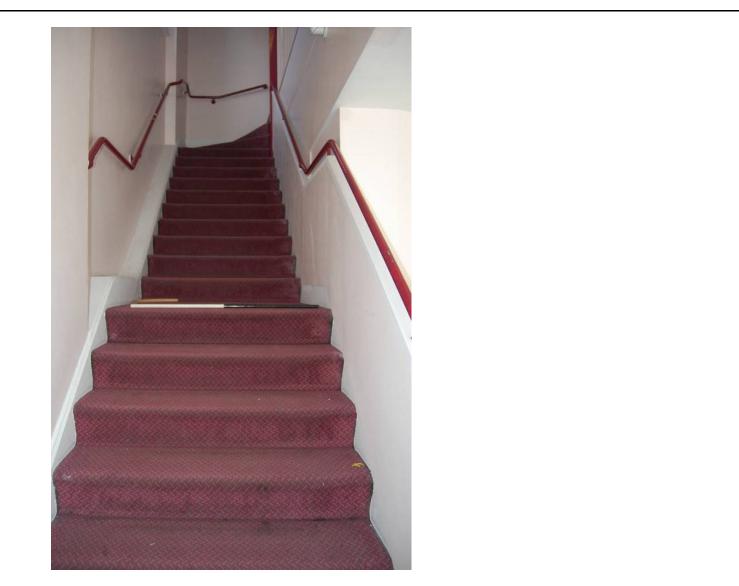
20-23 Long Lane and 22 Lindsey Street, stair detail
